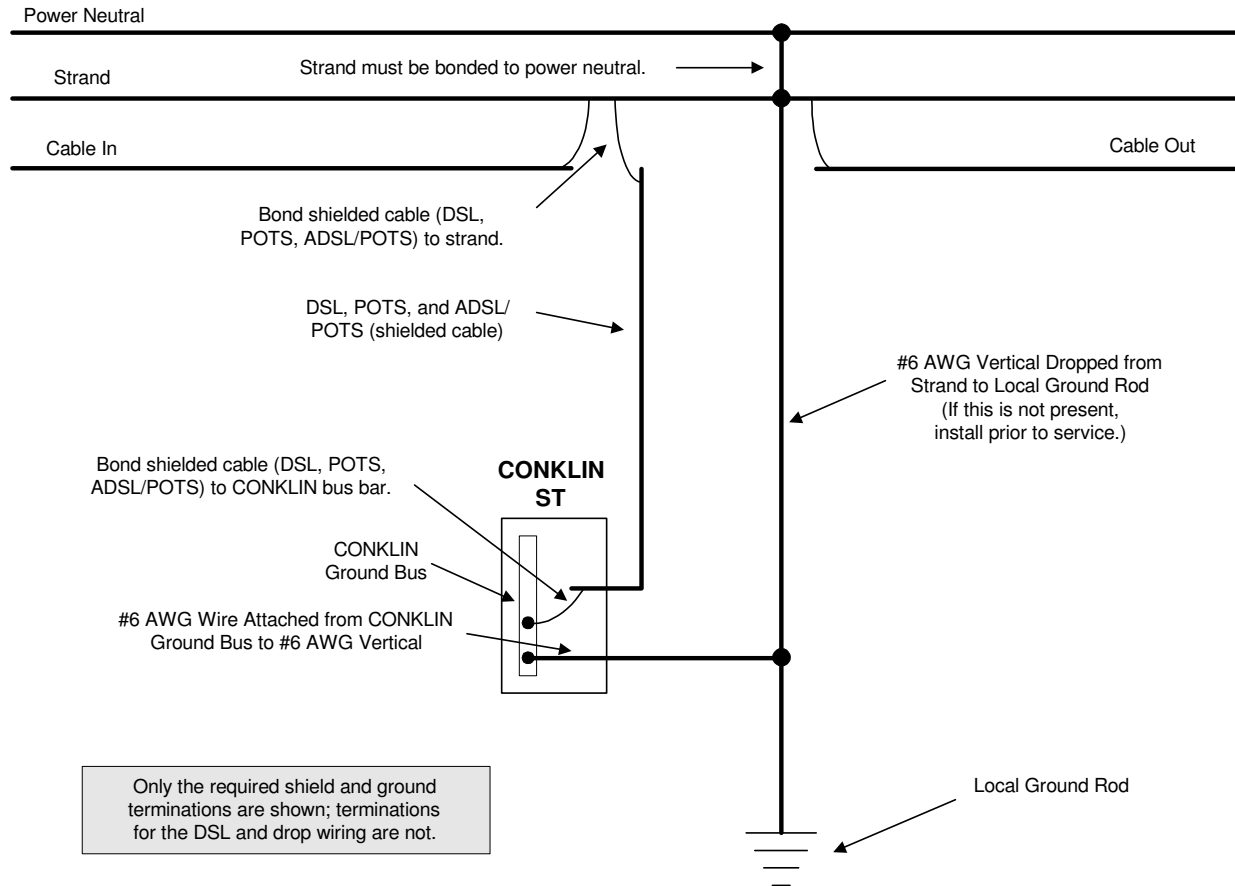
Grounding Method for Joint-Use Aerial Plant
